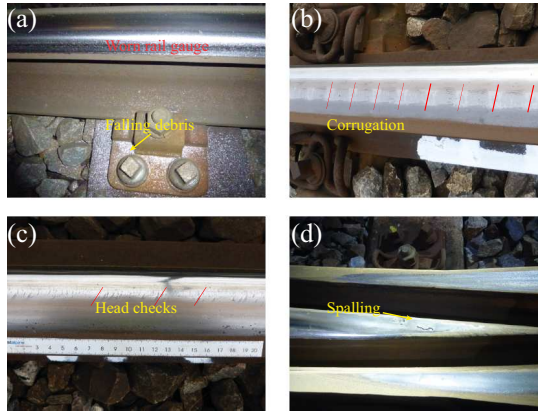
Damage of W/R interface: (a) Wear; (b) Corrugation; (c) Head checking; (d) Spalling at crossing rail.
